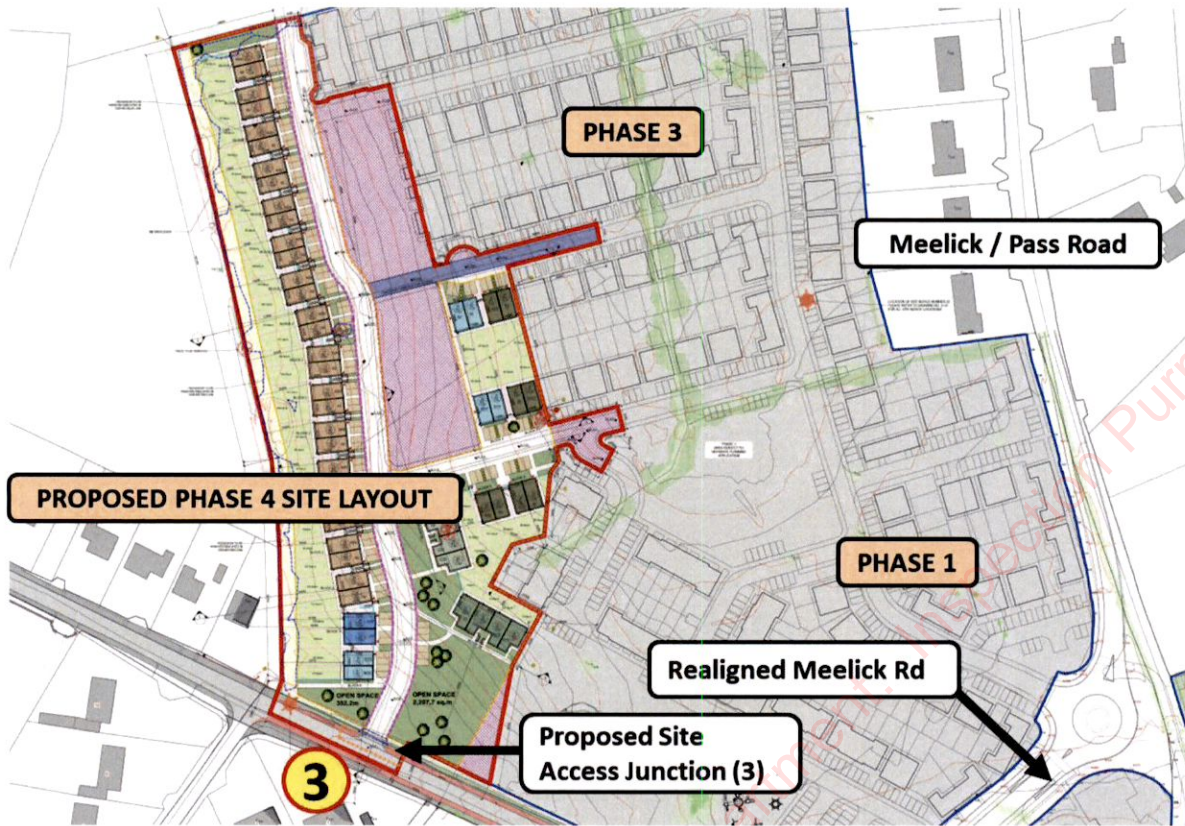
Proposed Phase 4 Road Layout (extract from drawings & labelled for ease of understanding)
